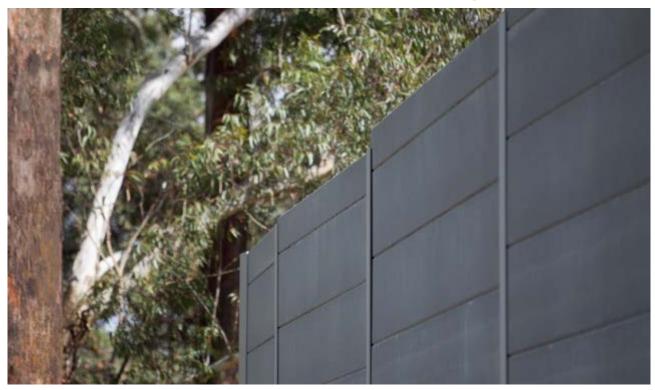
Hebel Wall Noise Barrier at the Cheltenham Services Facility Site
